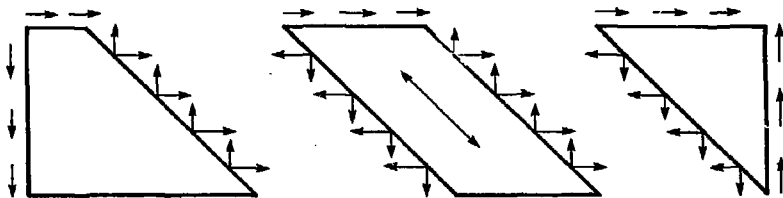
Free Body of Wall with Diagonal Tension Cracks
